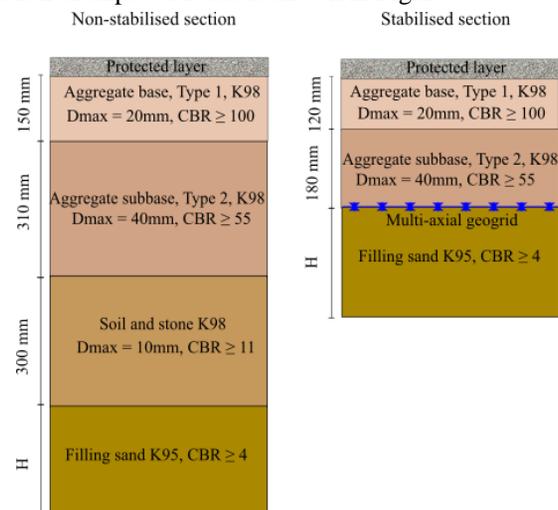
Non-stabilised and stabilised structure for the unpaved road
